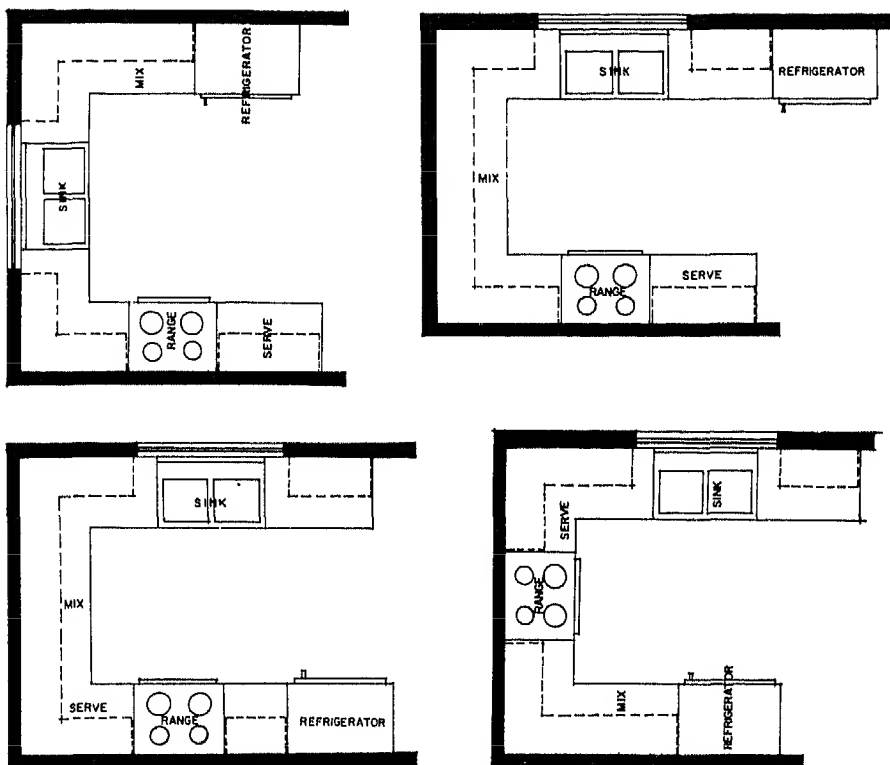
U-shaped plans. If dishwasher is desired, it should be located at sink center.
